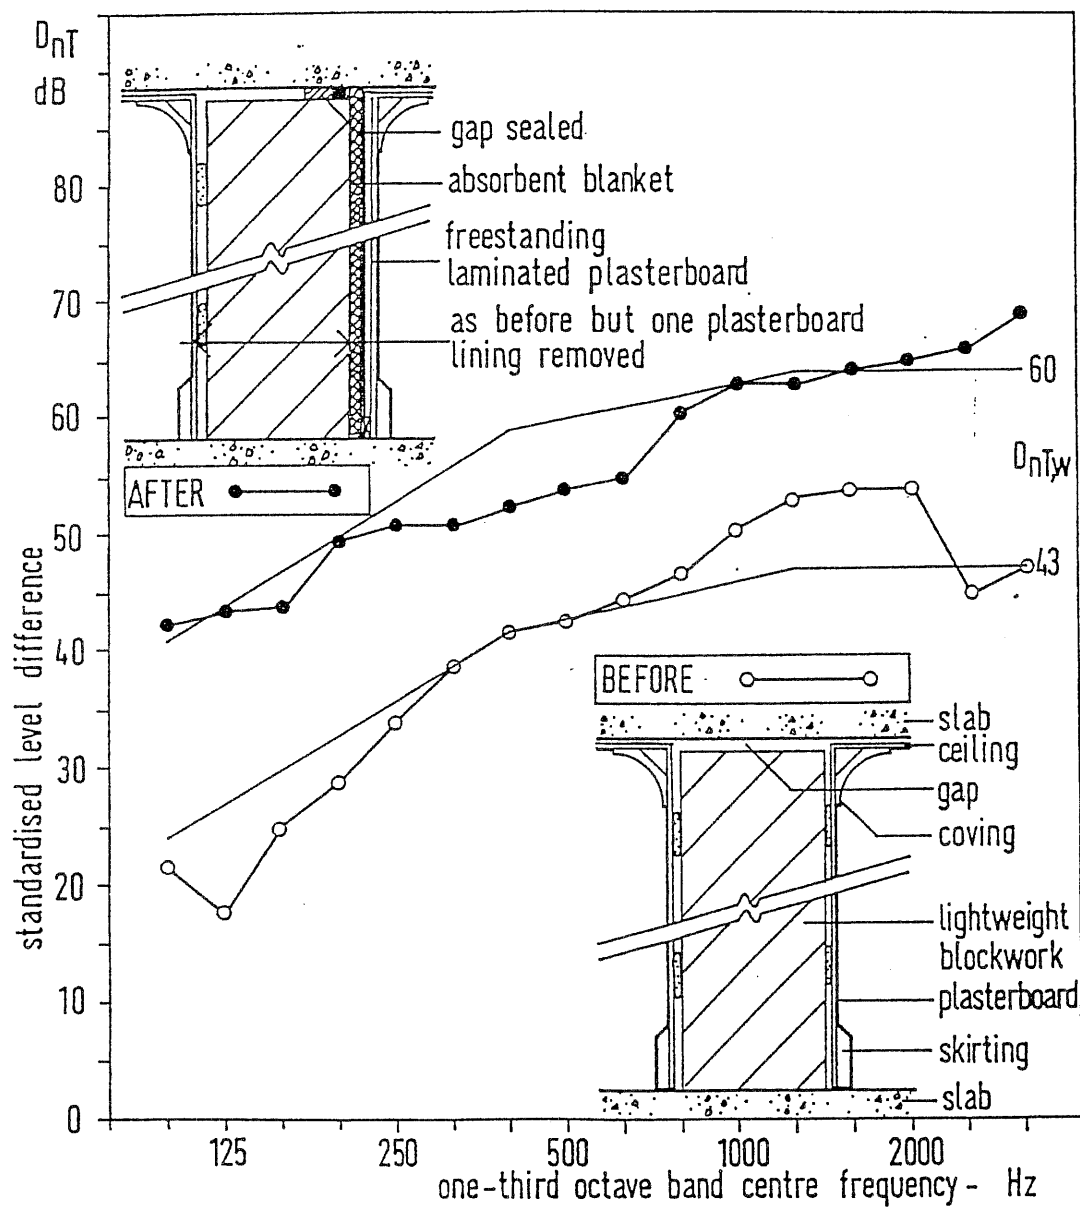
SOUND INSULATION IMPROVEMENTS TO A DRY-LINED BLOCKWORK SEPARATING WALL
